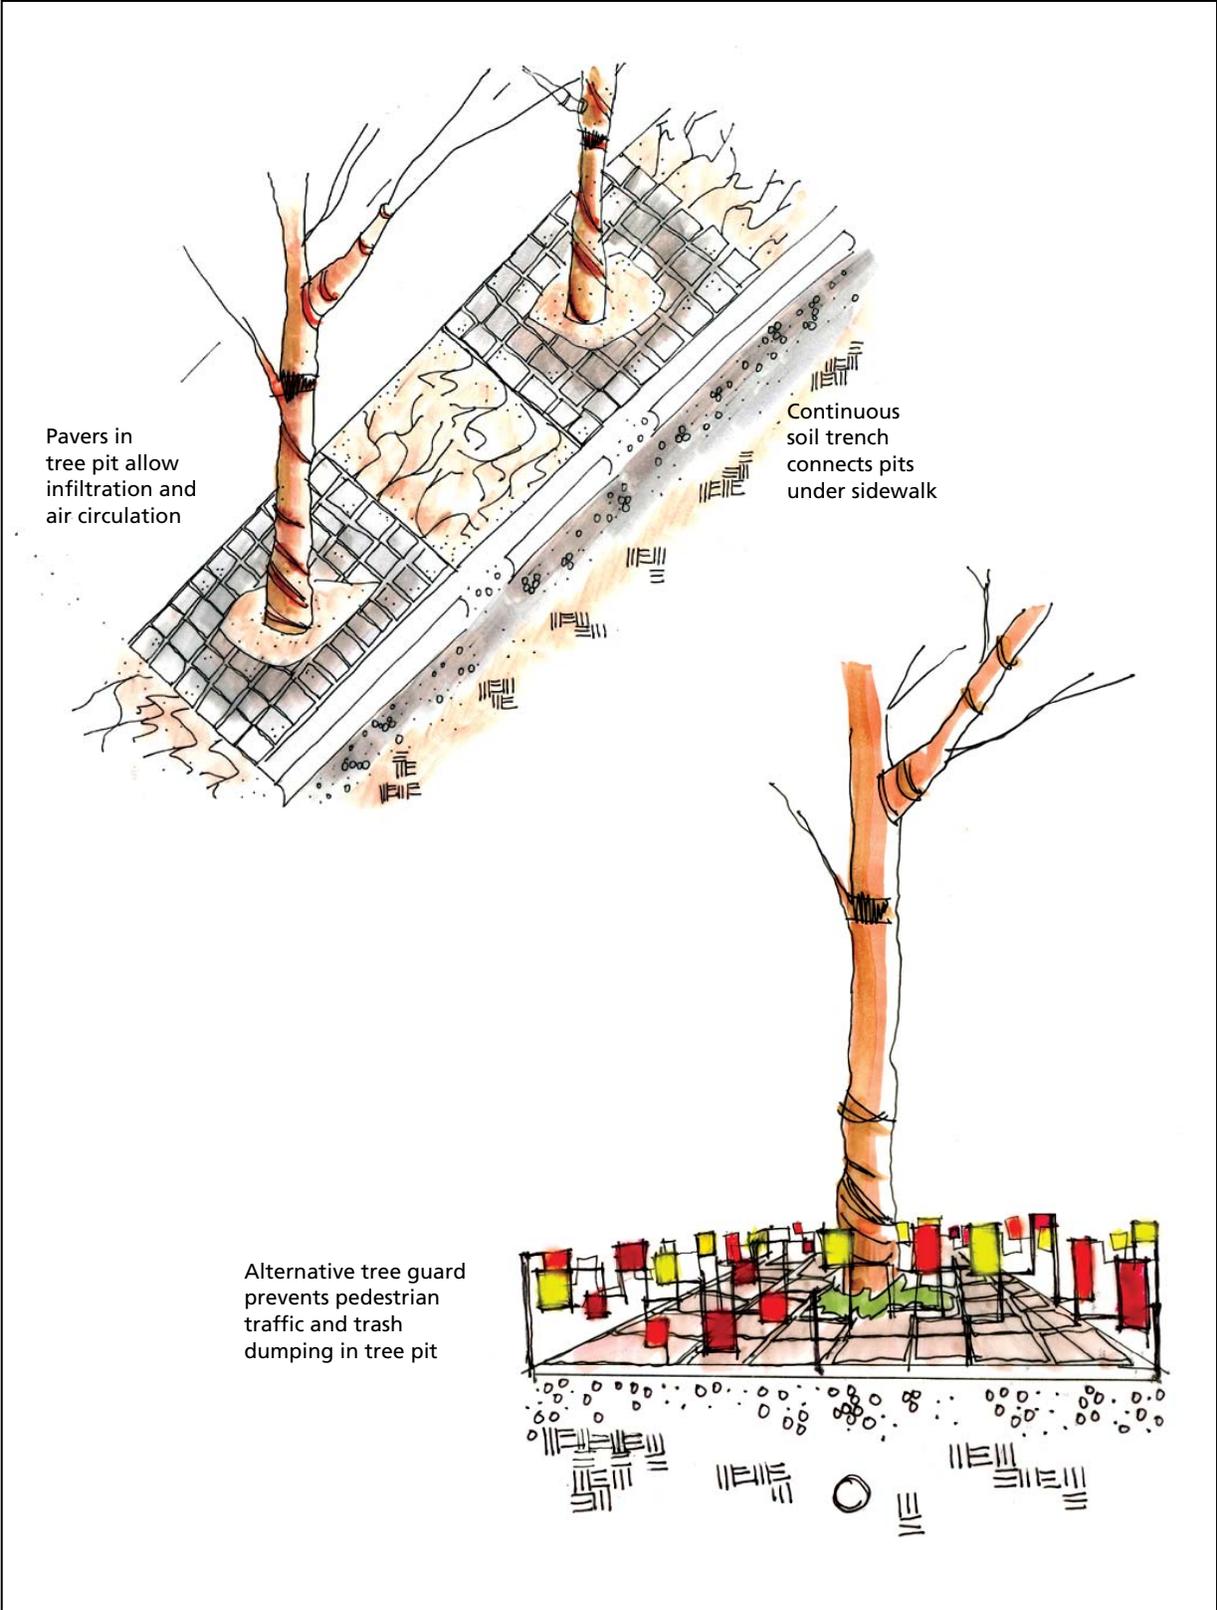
Tree pits are connected through a soil trench, and tree pit protection prevents damage from pedestrian traffic.
